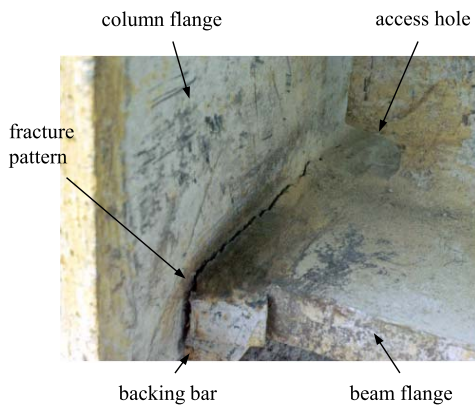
Fracture pattern observed during the 1994 Northridge earthquake in a welded unreinforced flange, bolted-web connection. (Image courtesy of Professor Michael Engelhardt, University of Texas at Austin.)
